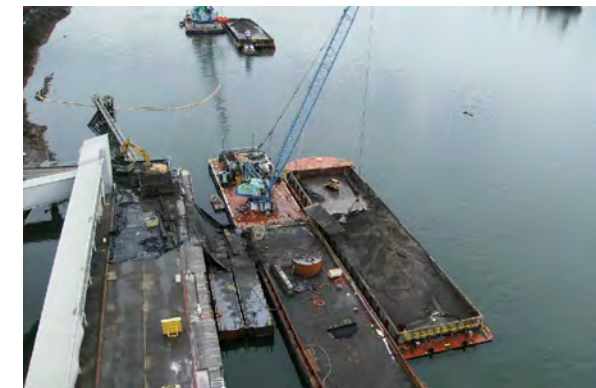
EXAMPLE OF OFFLOADING TO TRUCKS OPERATIONAL CONTROLS
